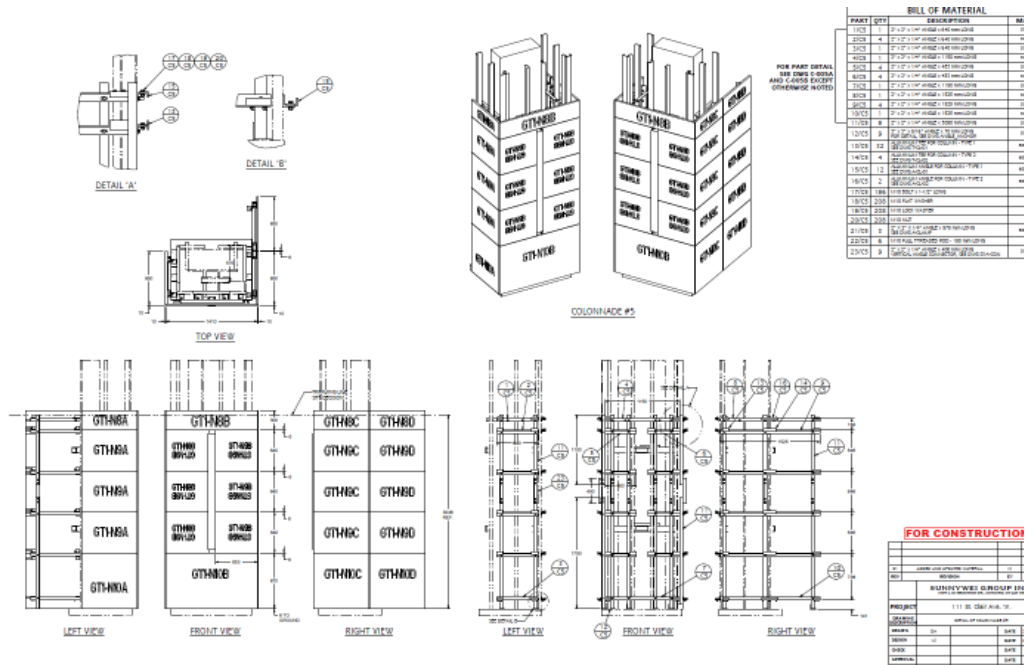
2D & 3D Layout Design of Customized Columns & Support Framing (Toronto Imperial Plaza)
